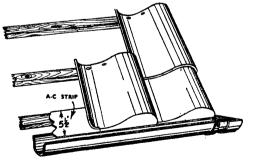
EAVES FINISH FOR LARGE PANTILE ROOF
